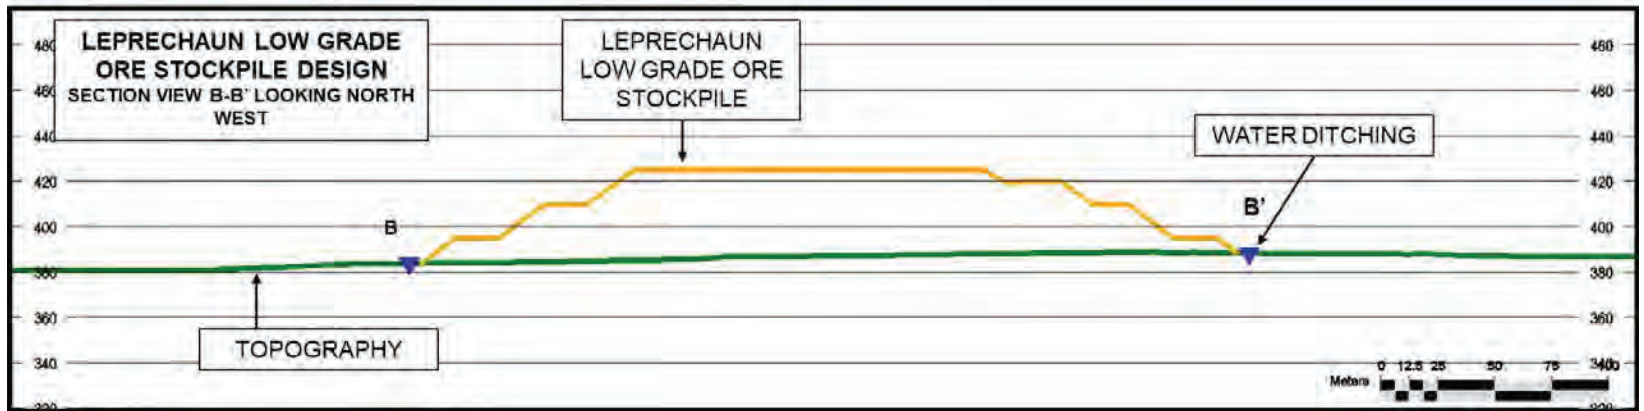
Leprechaun Low-grade Ore Stockpile Design – Section View B-B' Looking Northwest
